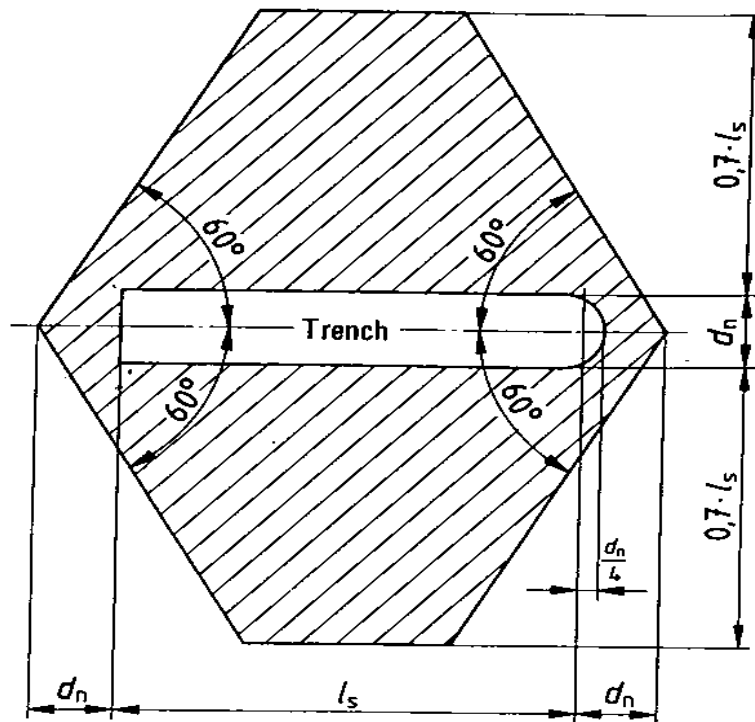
Critical zone of a trench, shown in plan view and determination of the trench length,  $l_s$
